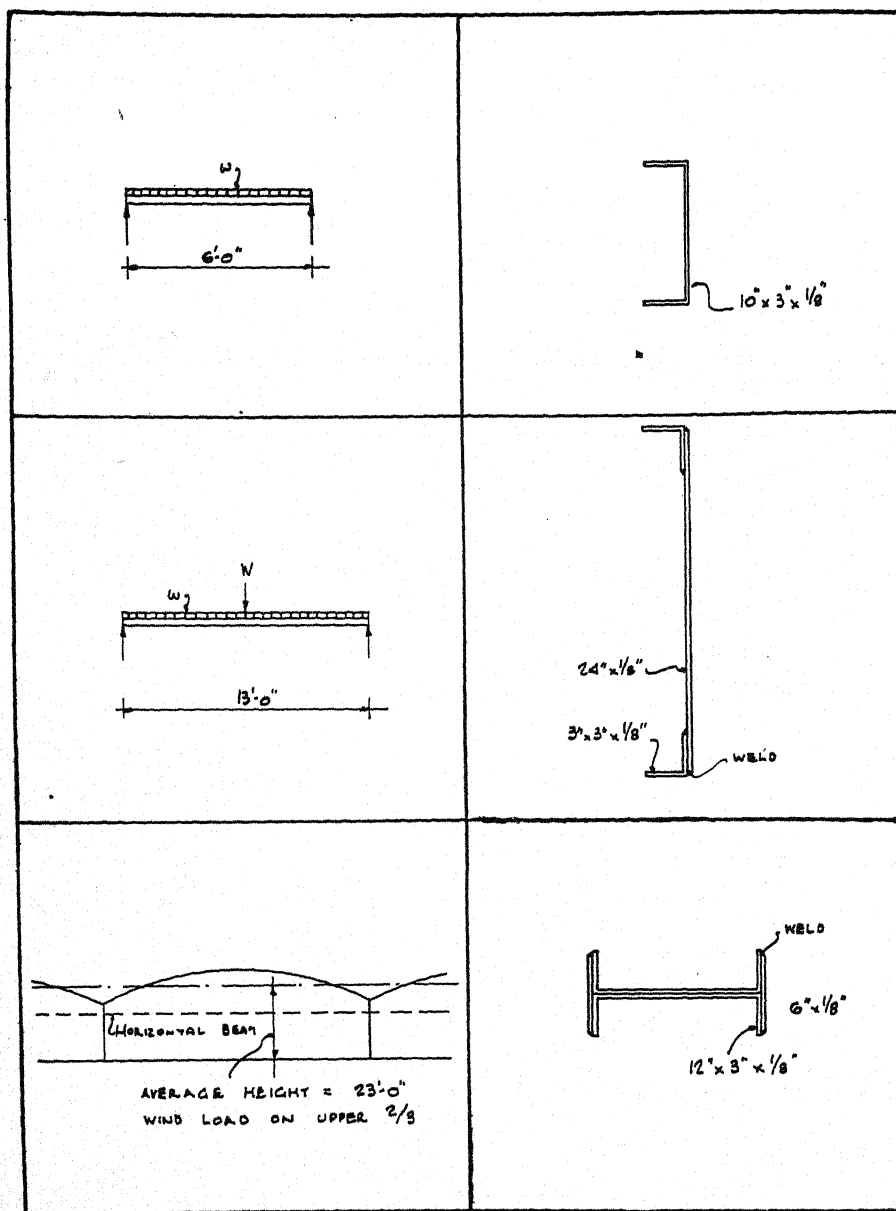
, (upper left)—wall beam at gable end. Fig. 14, (upper right)—section of wall beam, 6-foot span. Fig. 15, (center left)—wall beam at top of gable end. Fig. 16, (center right)—section of wall beam, 17-foot span. Fig. 17, (lower left)—wind load diagram, 360-foot walls. Fig. 18, (lower right)—section of horizontal wind beam, 360-foot walls.
